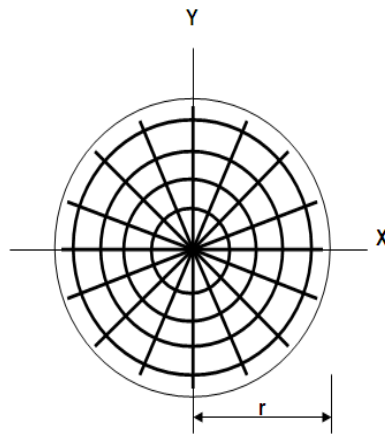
Plant of a circular footing with reinforcing steel in radial form.
